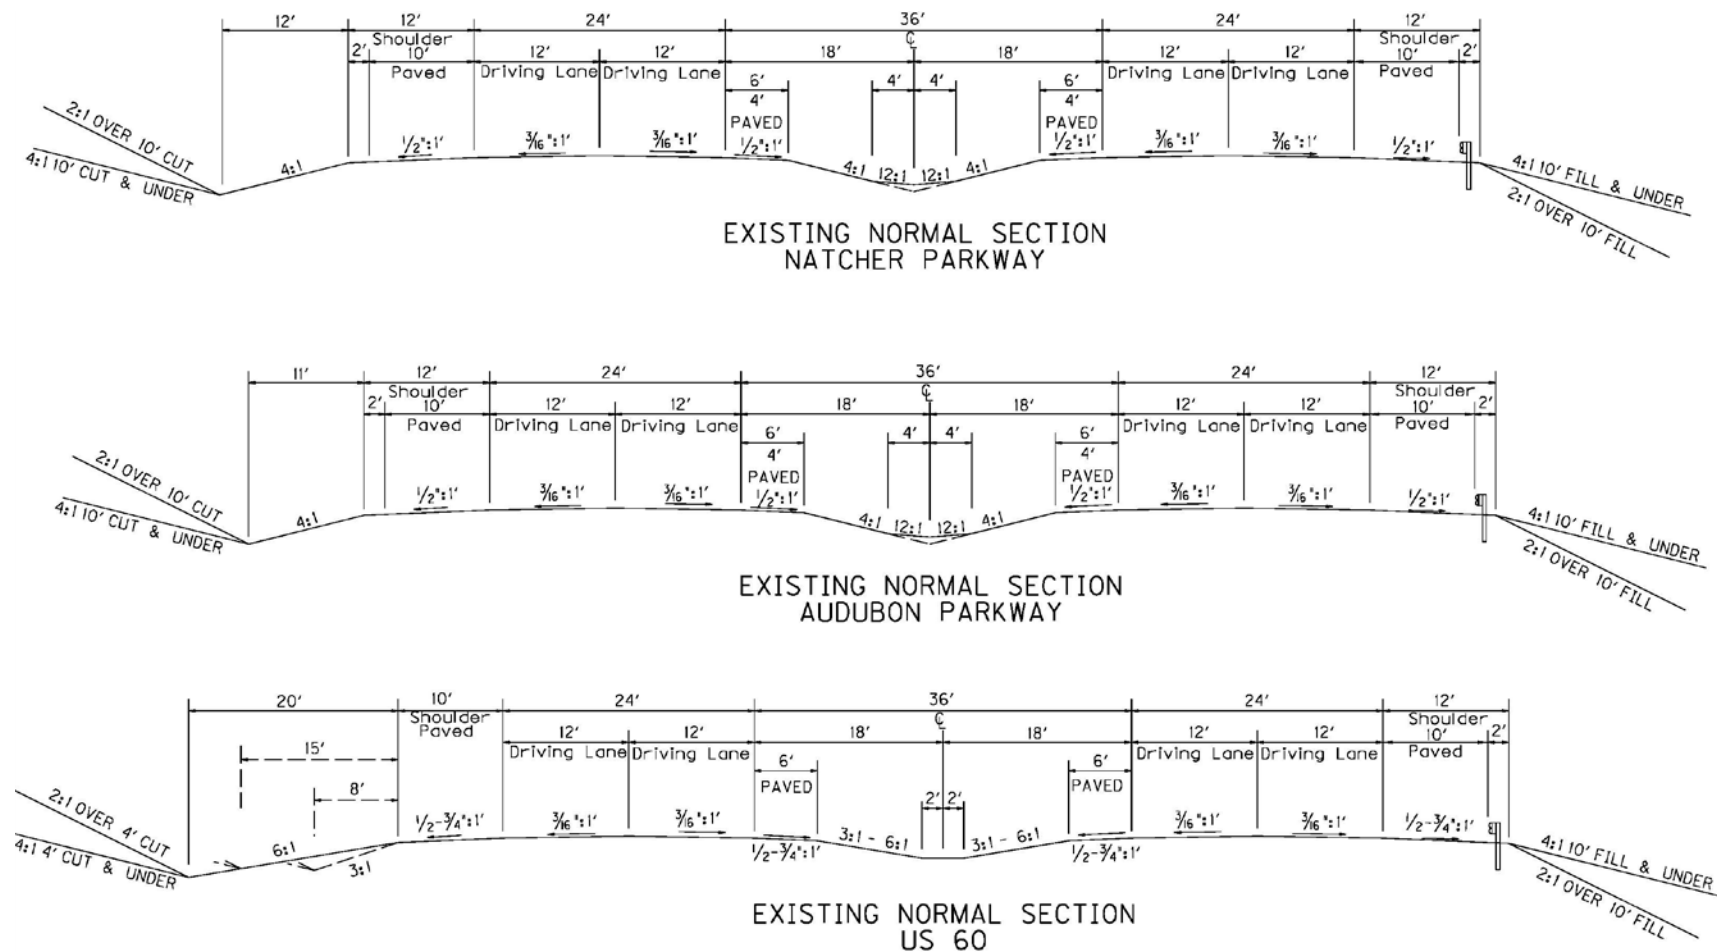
Existing Audubon Parkway, Natcher Parkway, and US 60 Typical Sections
